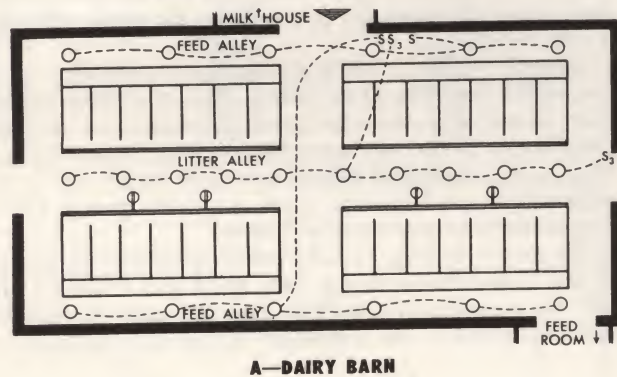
FARM BUILDING WIRING PLANS WITH OUTLET AND SWITCH LOCATIONS
